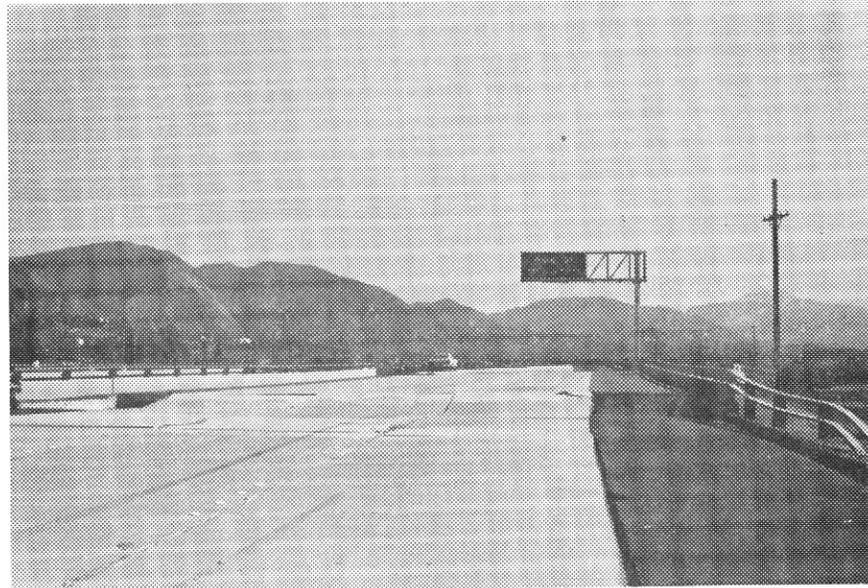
Looking east at the eastbound structure of the Roxford Street Undercrossing. Note settlement of pavement relative to structure deck. Note also separation of pavement slabs and the broken approach slab. The tire skid marks leave little doubt as to the whereabouts of one motorist at the time of the earthquake.
